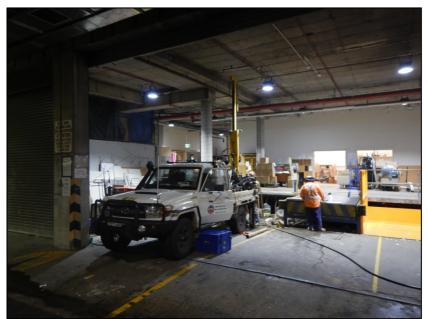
General area of David Jones loading dock (Drilling rig at Bore 302 location). New shear wall will be located to the rear of the raised area
